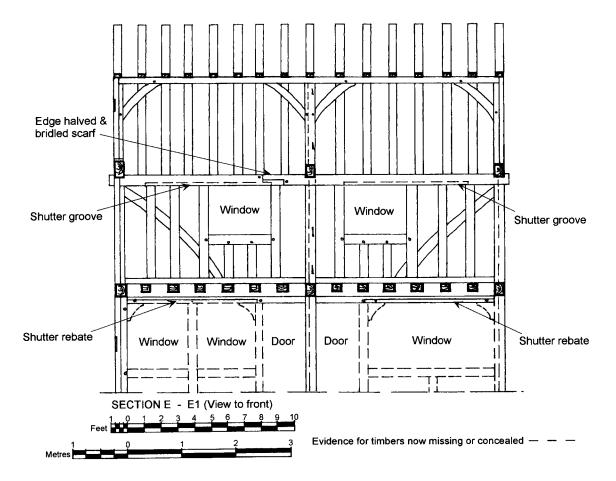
No. 1 Church Street, Coggeshall, longitudinal section looking south towards the street frontage.
